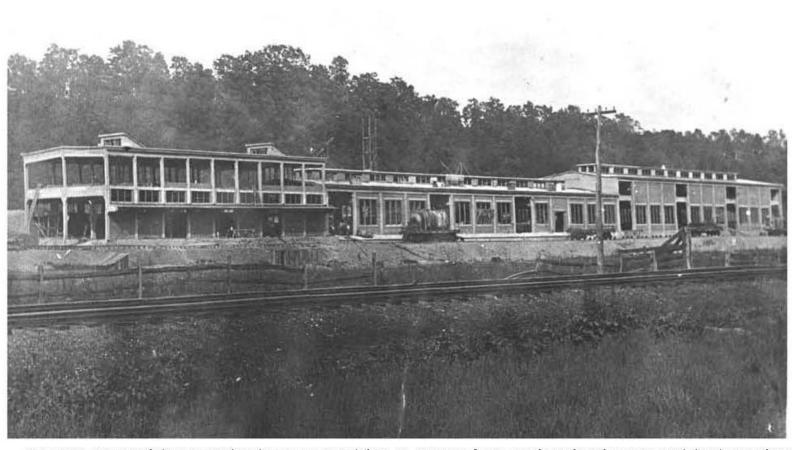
1907 VIEW SOUTHEAST OF BUILDINGS 2, 3, AND 5 (LEFT TO RIGHT) UNDER CONSTRUCTION Copy courtesy of Robert Castagna
